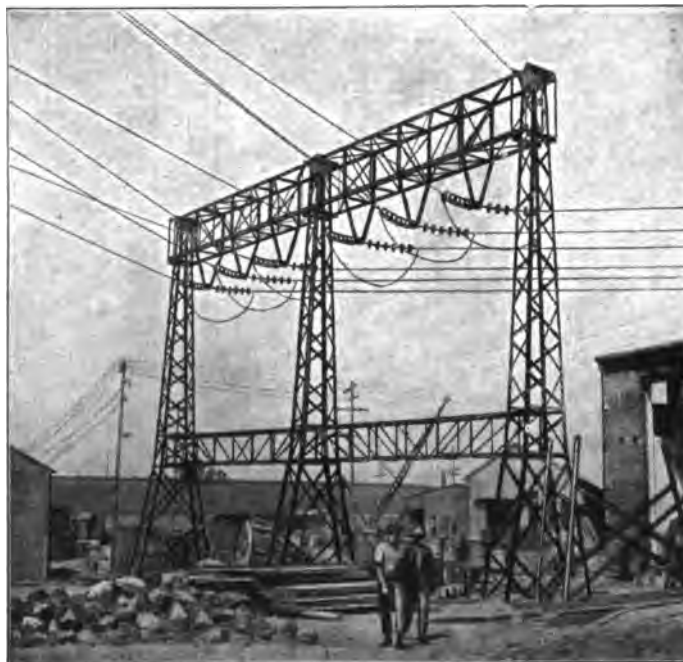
Vereeniging Power Station. Anchor Masts for 80,000-Volt Conductors at the point where the latter enter the Switch House.
